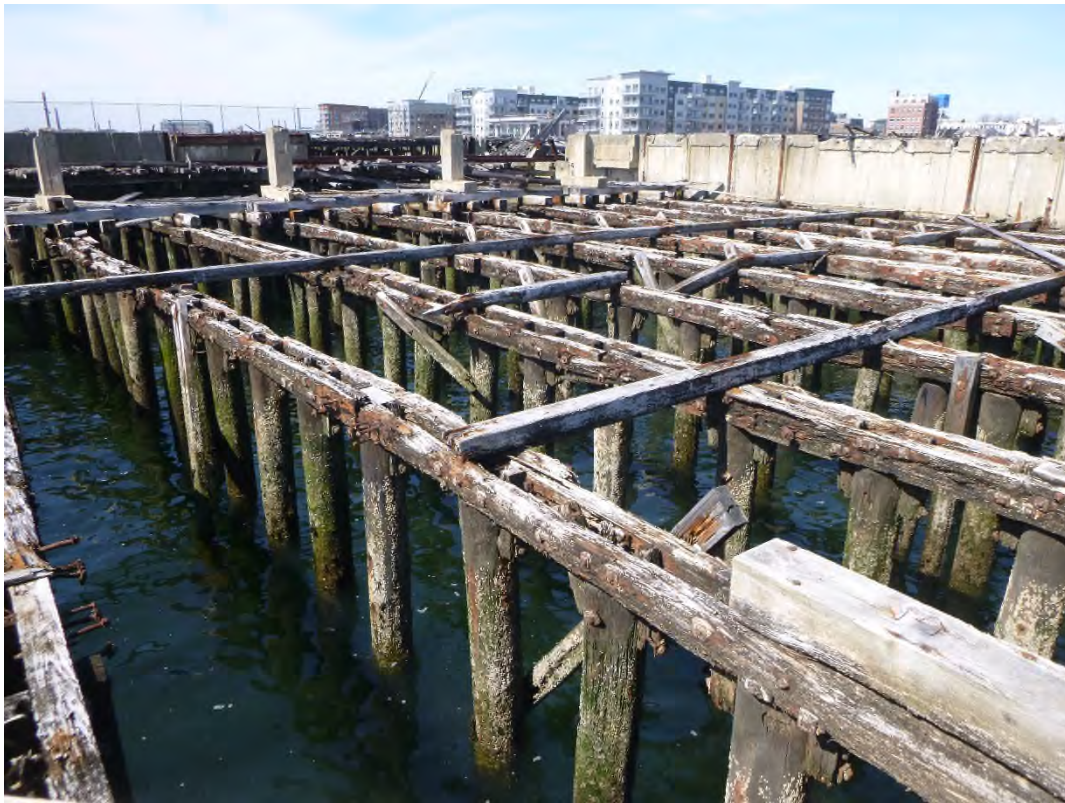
Overall condition of interior timber pile cap and timber beams.
